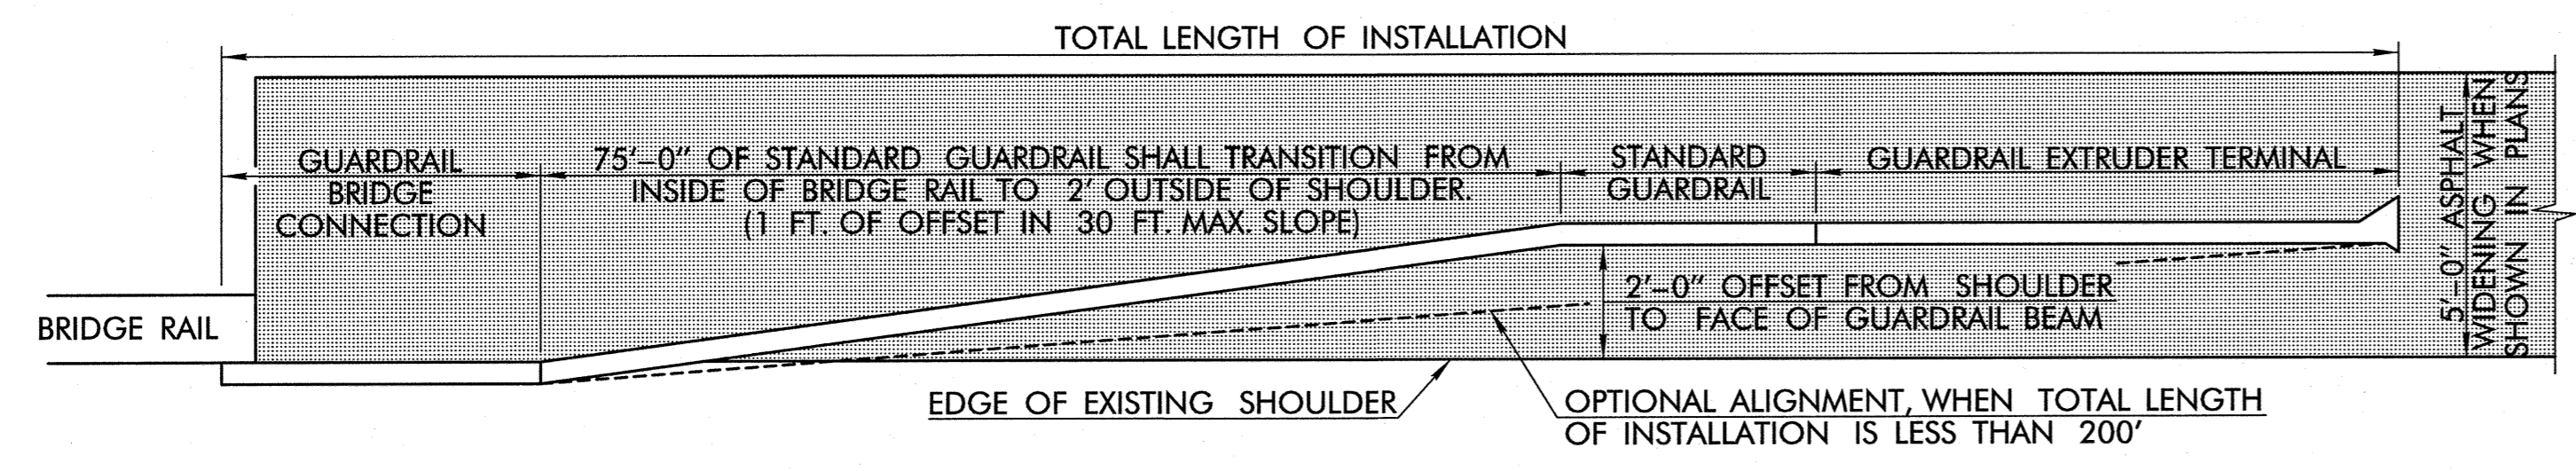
DETAIL OF SHOULDER WIDENING FOR STANDARD GUARDRAIL
